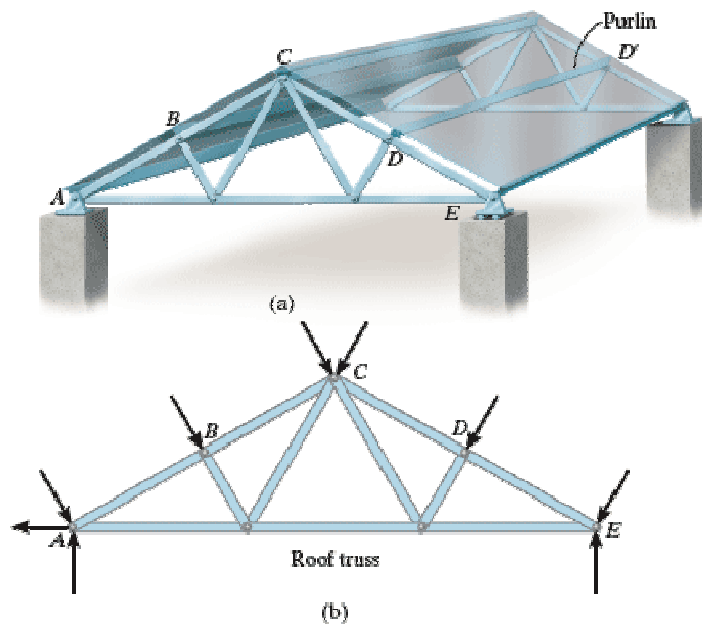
Planar trusses are commonly used to support bridges and roofs.
